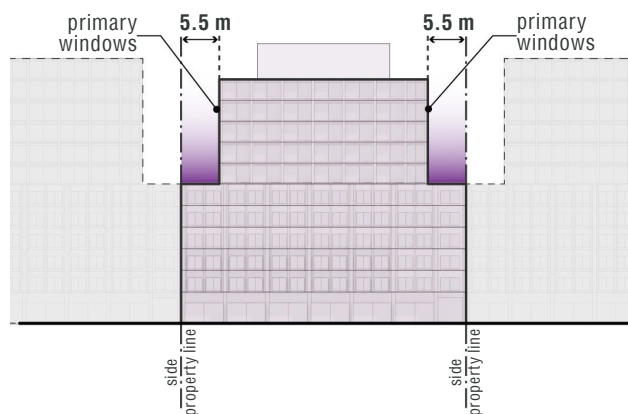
Illustration of side yard setbacks in main street or emerging main street contexts where upper storeys above the streetwall should provide a minimum of 5.5- metre setback.
